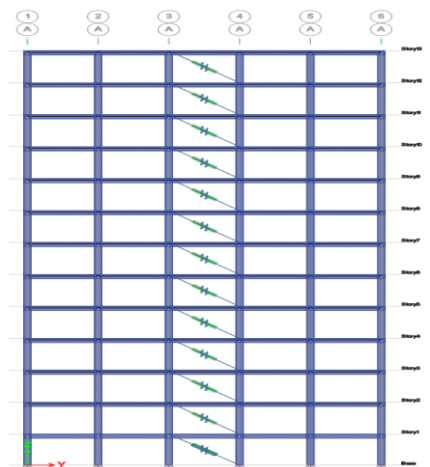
RC Bare Frame with Dampers at Middle (BDM)
